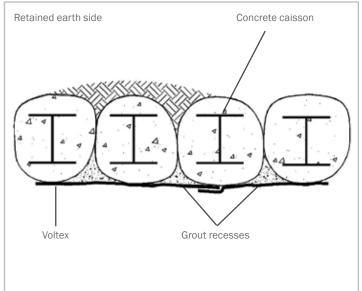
Fill in recesses between cast caissons with grout to provide smooth surface (Plan View).
